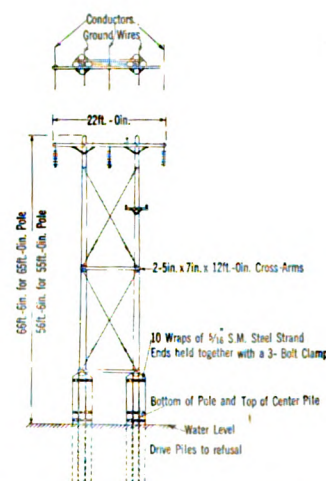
PILE FOOTINGS FOR STRUCTURES PLACED IN MARSHY OR BOGGY GROUND
